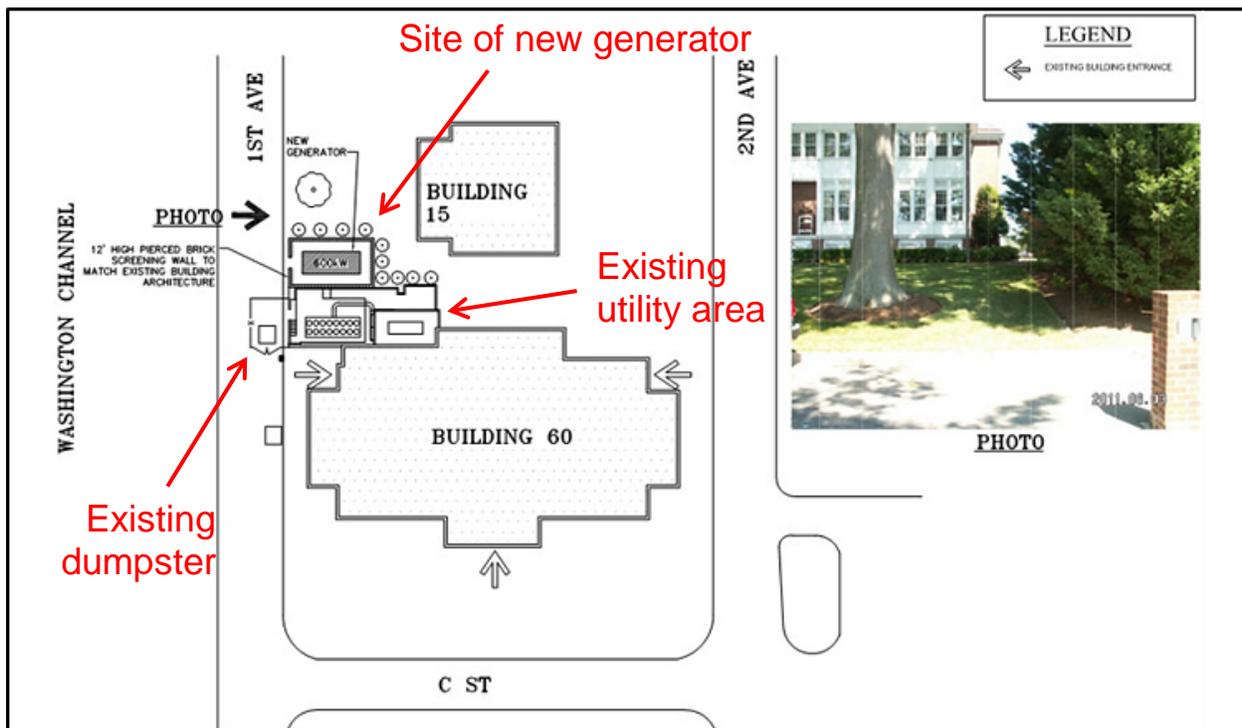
Site plan of new generator within the yard of Building 15—approved by the Commission December 1, 2011
